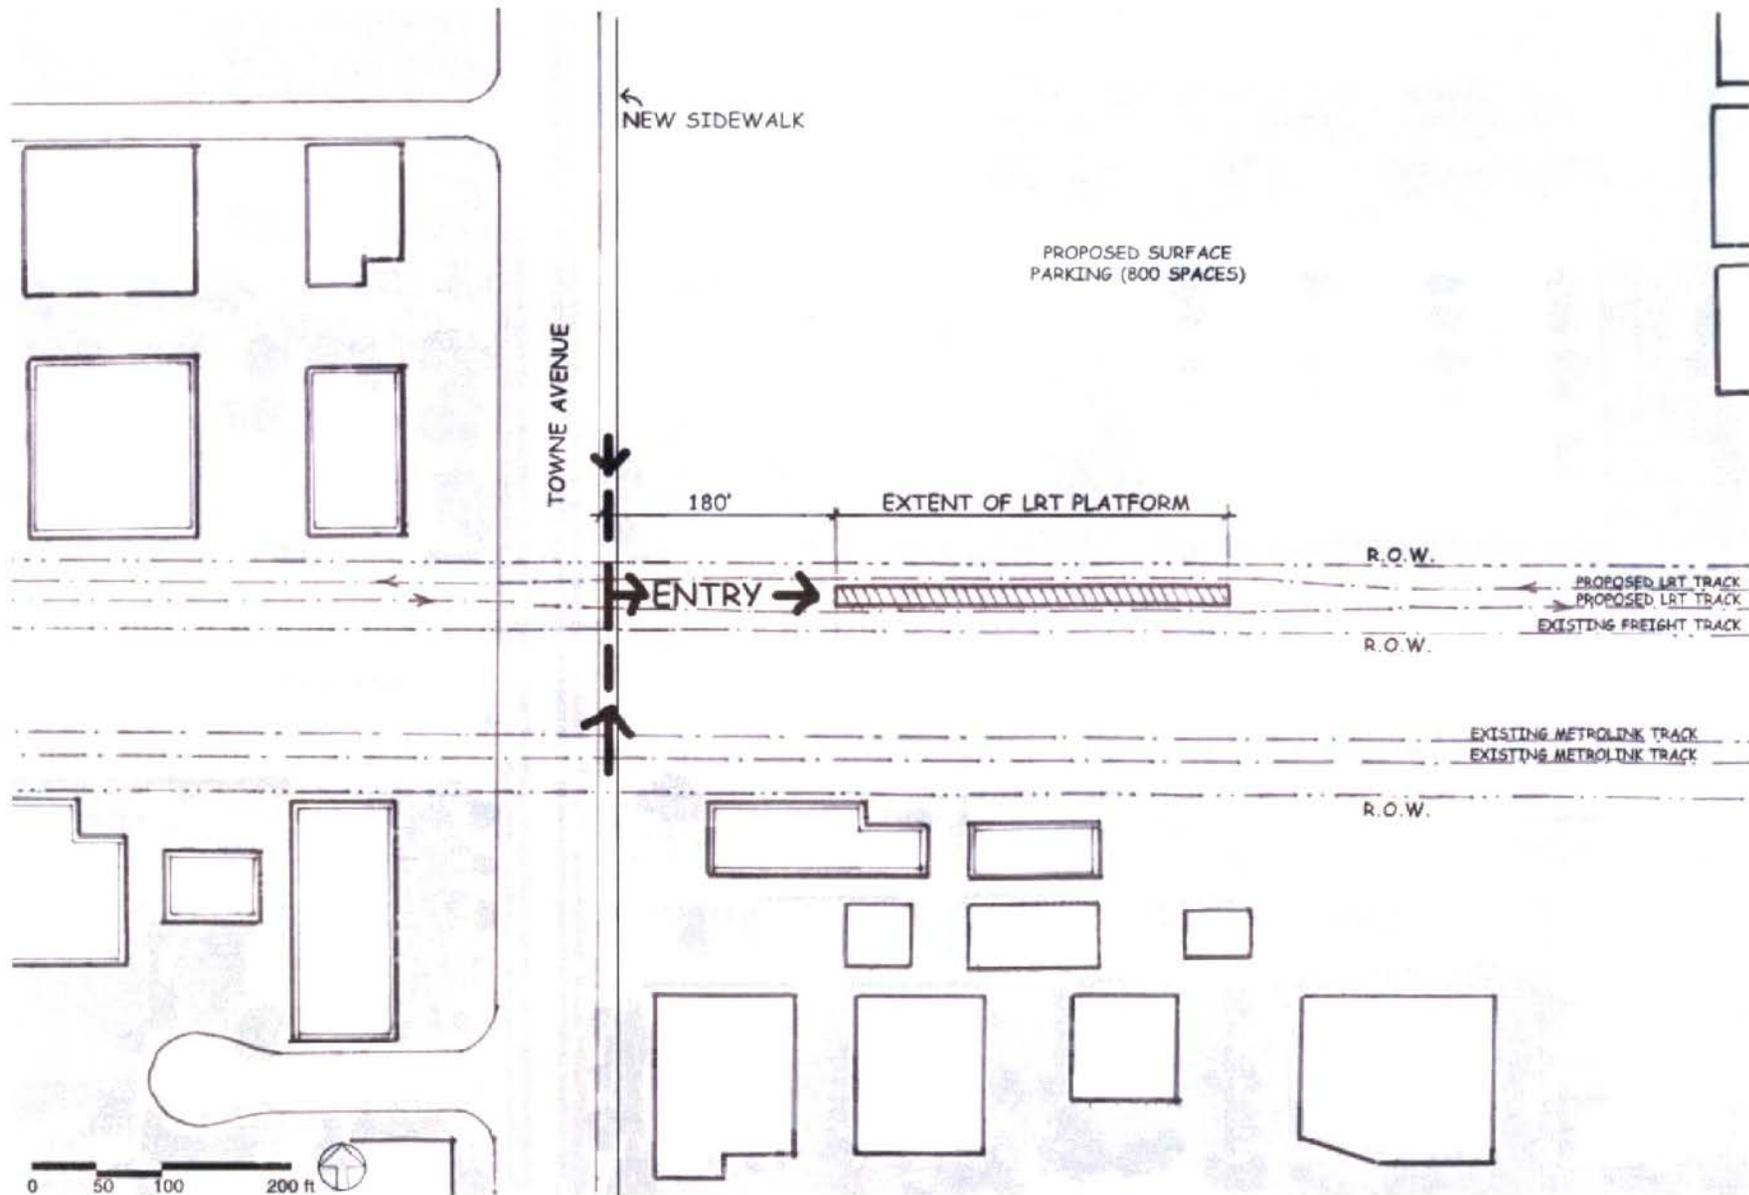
Site Plan: City of Pomona Towne Avenue Station, Option D
